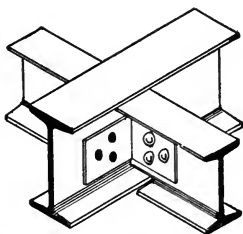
Isometrical View of Connection of Floor-beams to Girders.
